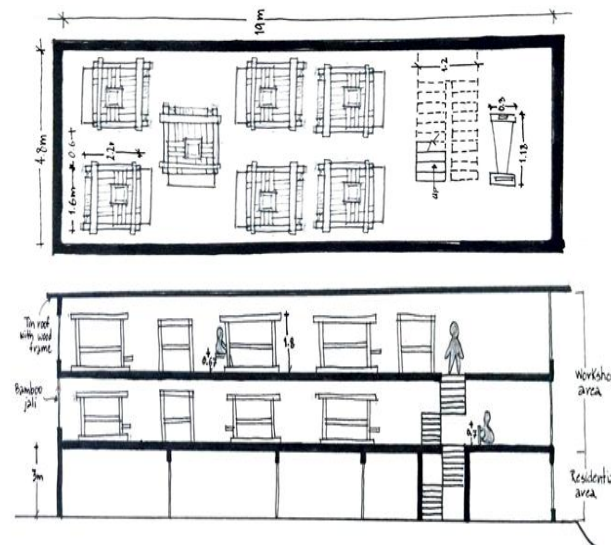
Floor Plan and Section of Surveyed Workshop area (Source: Authors)
